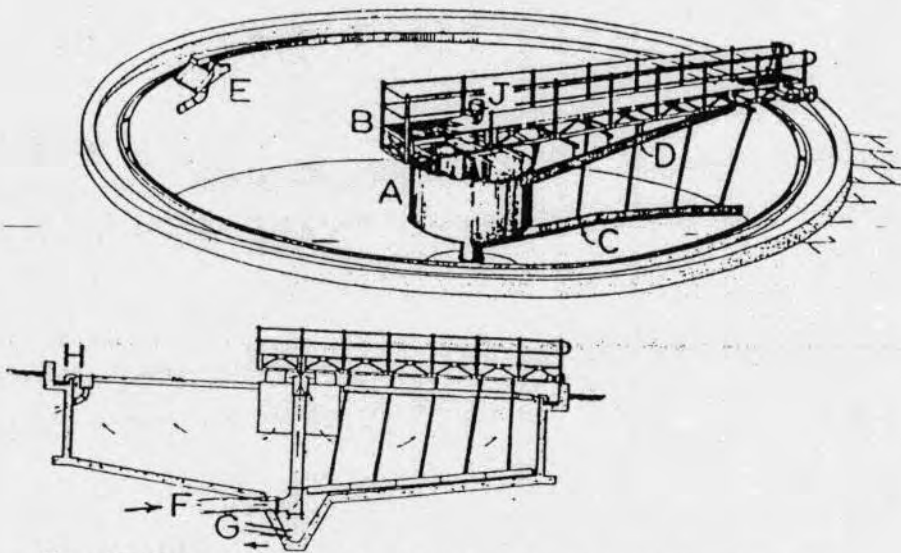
Perspective view and true elevation of circular radial flow sedimentation tank. A, inlet baffle; B, access bridge; C, sludge scrapers; D, scum collector bar; E, sludge discharge hopper; F, inlet pipe; G, sludge discharge pipe; H, effluent discharge weir; J, drive motor [Courtesy of Templewood Hawksley Activated Sludge Ltd]
